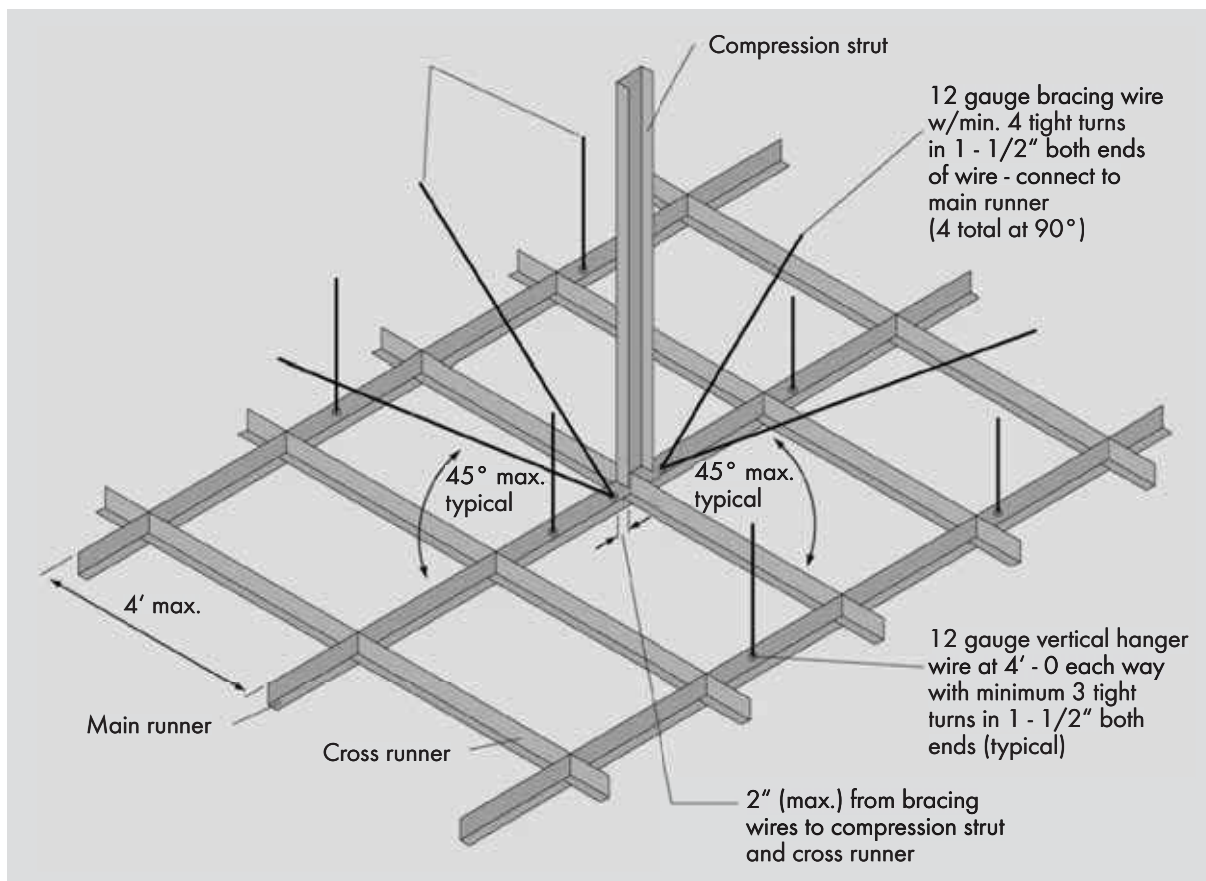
Seismic bracing for suspended acoustic lay-in tile ceilings / FEMA E-74 (2011)/
